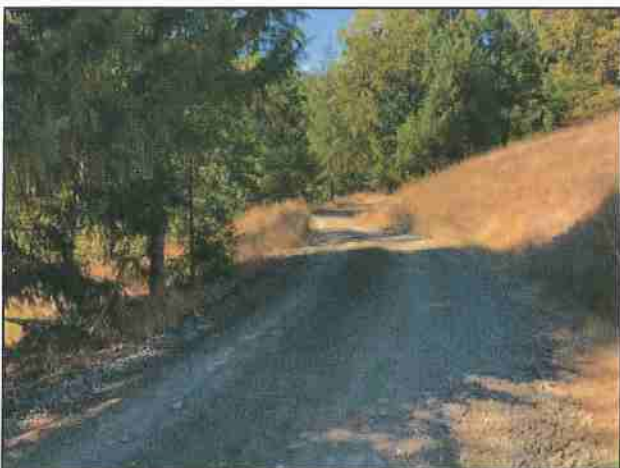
Private Access Rd @ Curve w/ Turnout Looking SW
